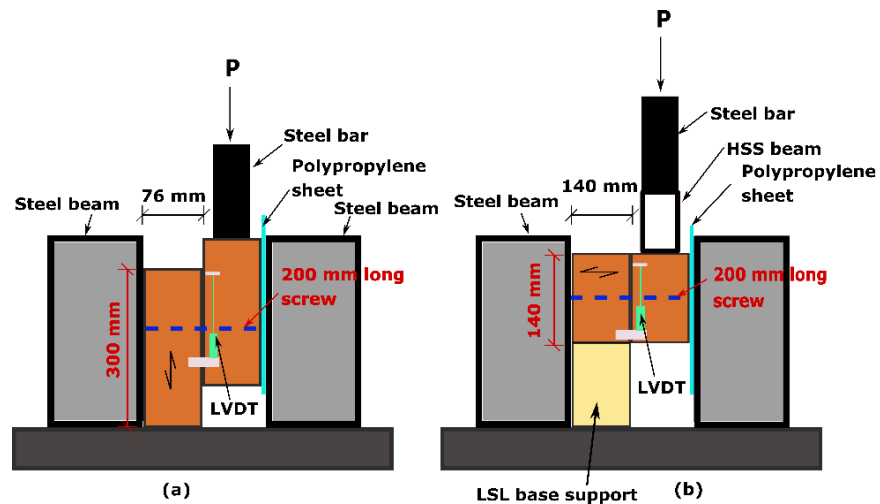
Schematics of Connection-C test setup: (a) Loading parallel to strand; (b) perpendicular to strand.
